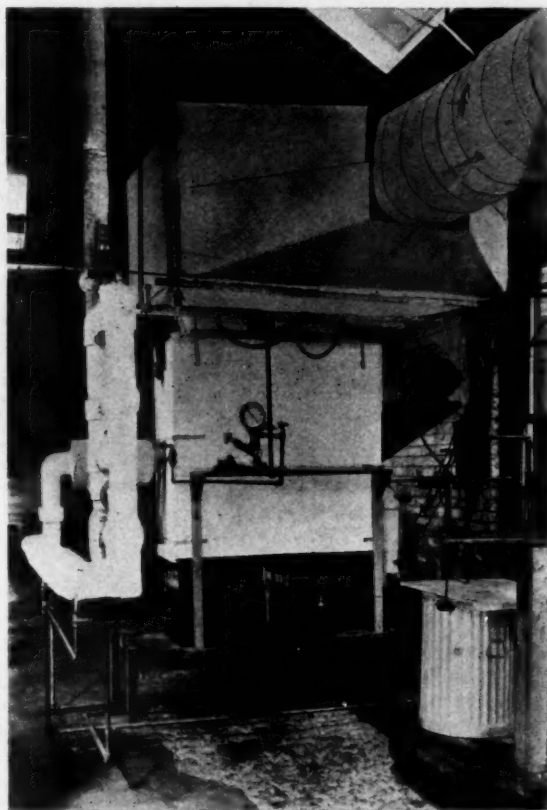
VIEW OF UNIT HEATER AND MIXING CHAMBER
